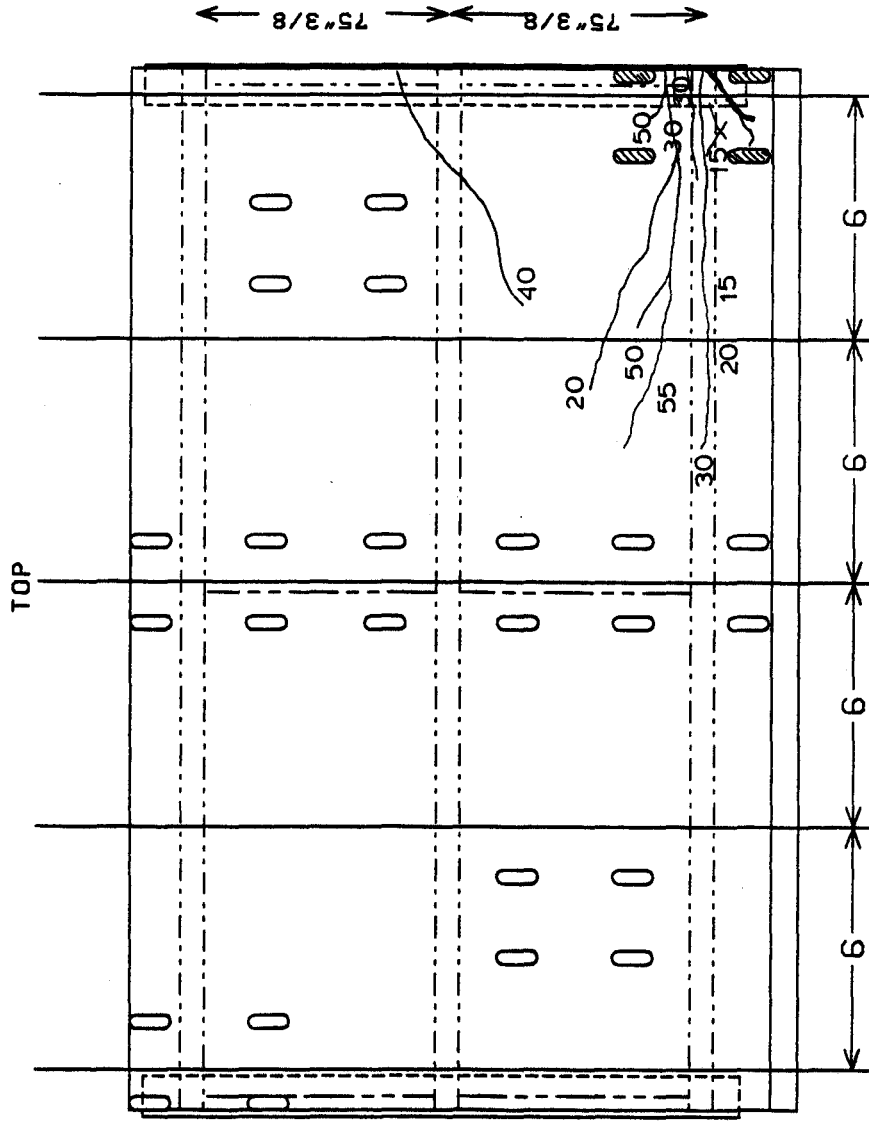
Top Cracking Pattern (Second Bridge - Test No. 7)
